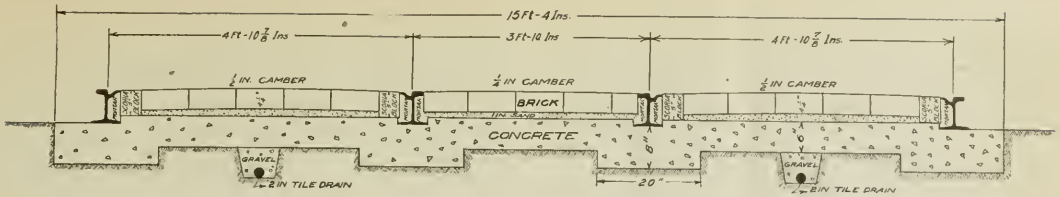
Brick Pavement, with $6\frac{1}{2}$ -in. Girder Rail, 1895 Construction
